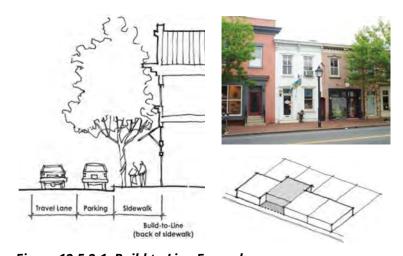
Build to Line ExamplesExamples illustrating that buildings located along a build-to line create a well-defined building edge (Source: Jacobs)
